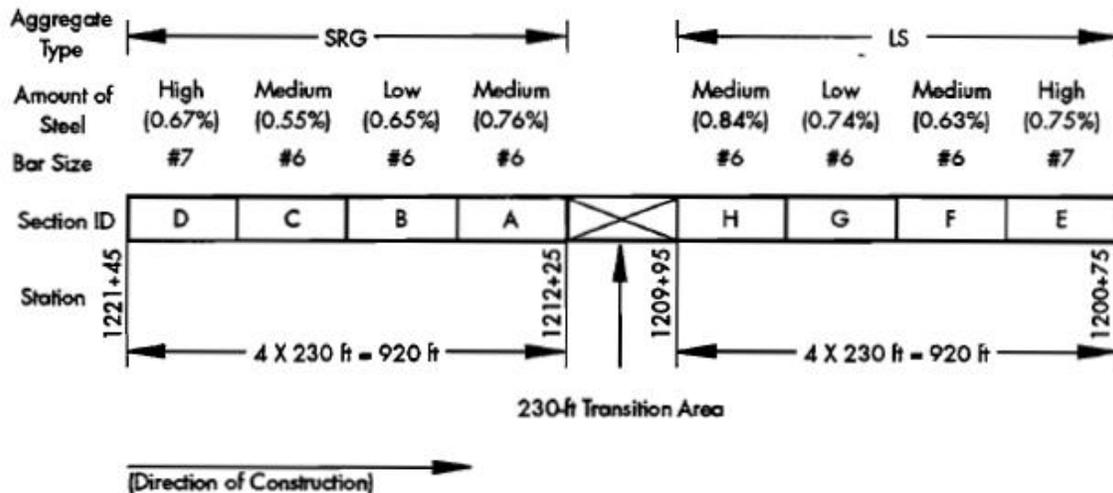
Layout of Test Sections in IH 45 in Spring Creek
